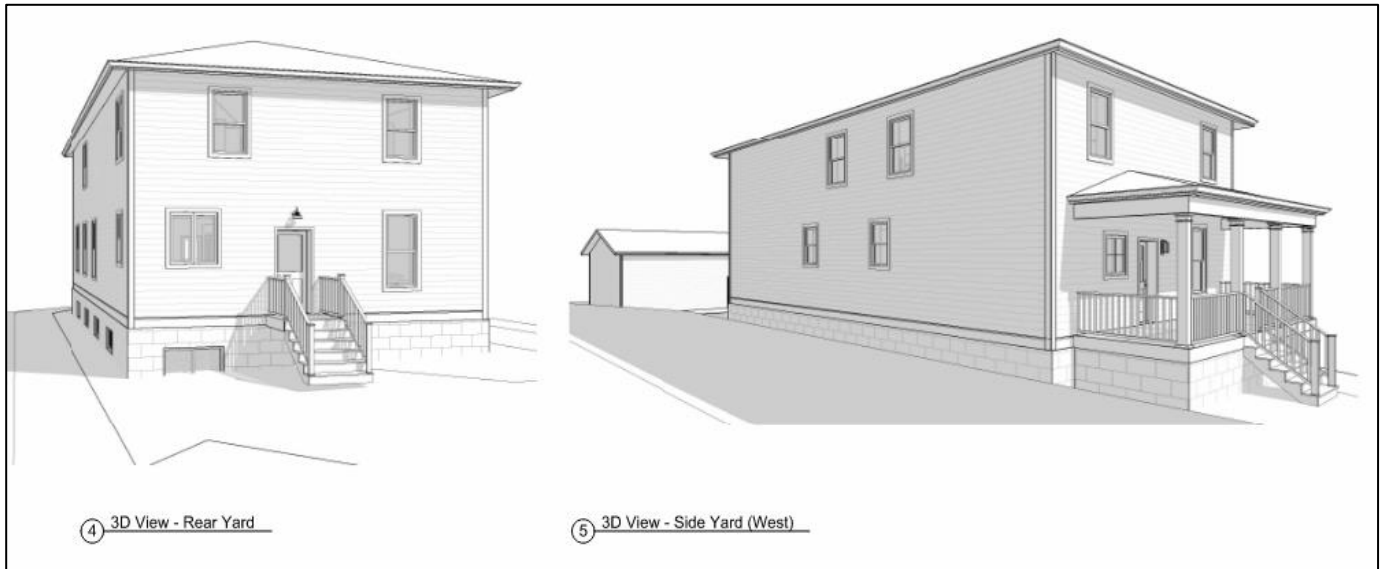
Rendering of North and West elevation of proposed single-family dwelling and garage.
